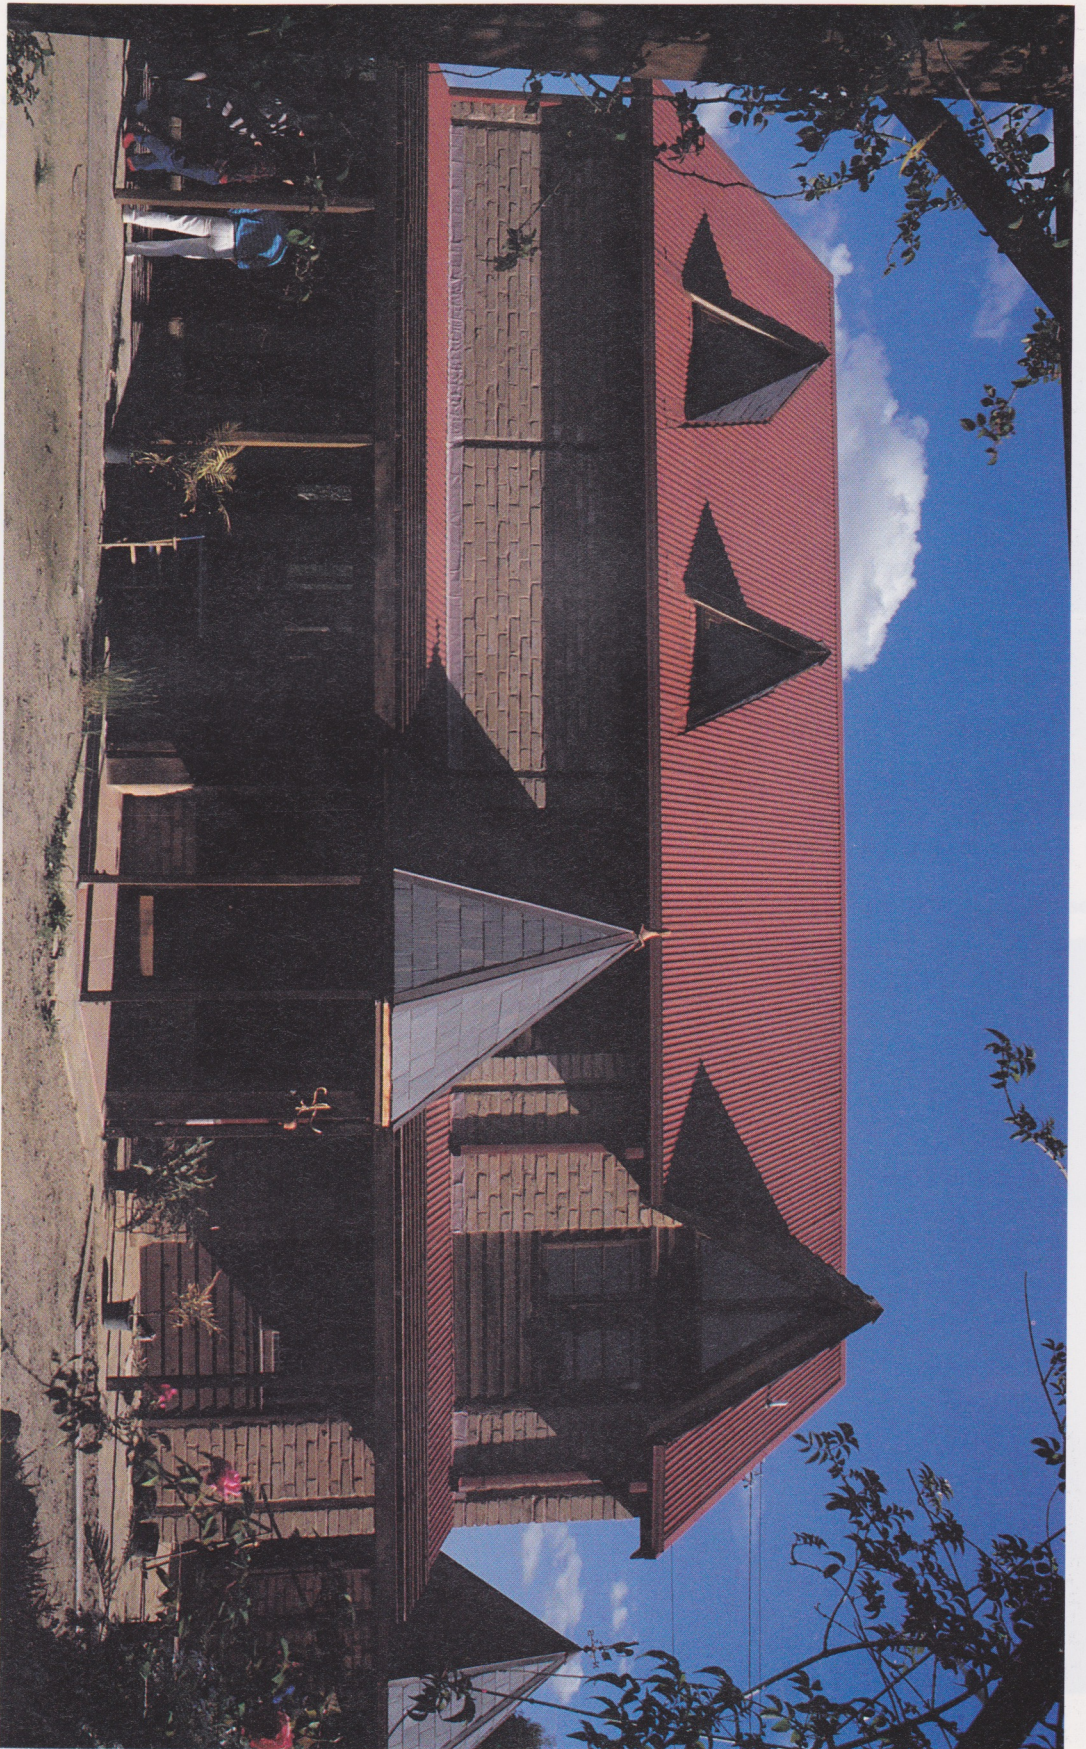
Timber framed house with cement-stabilised pressed-soil blocks as in-fill walls
